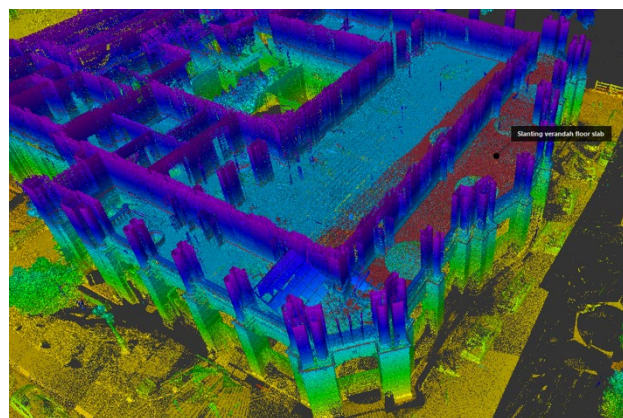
Sloping floor of verandah in Ipoh Town Hall and Post Office in point cloud data.
